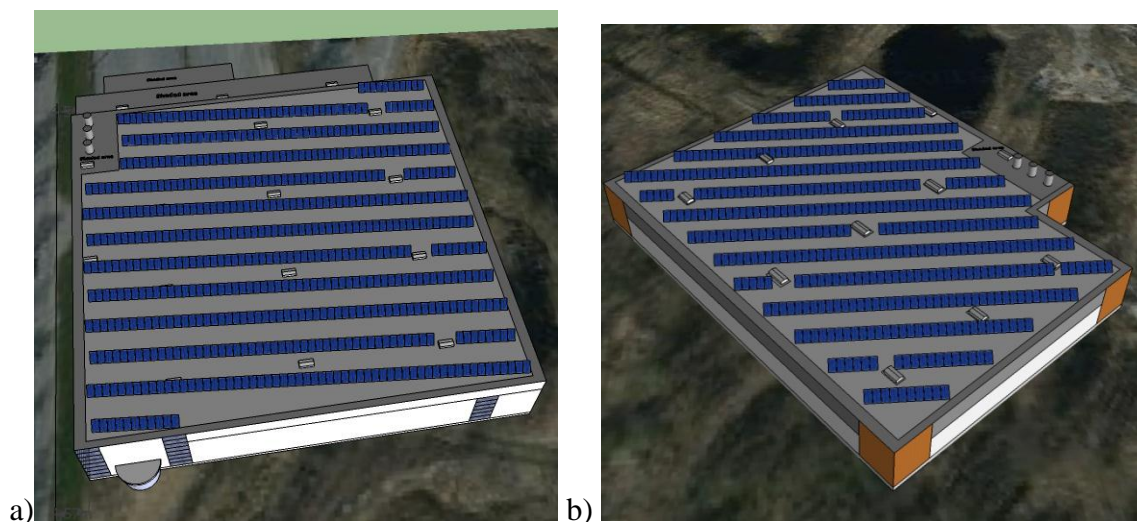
Azimuth 0° PV-array orientations of a) building 1 and b) building 2
